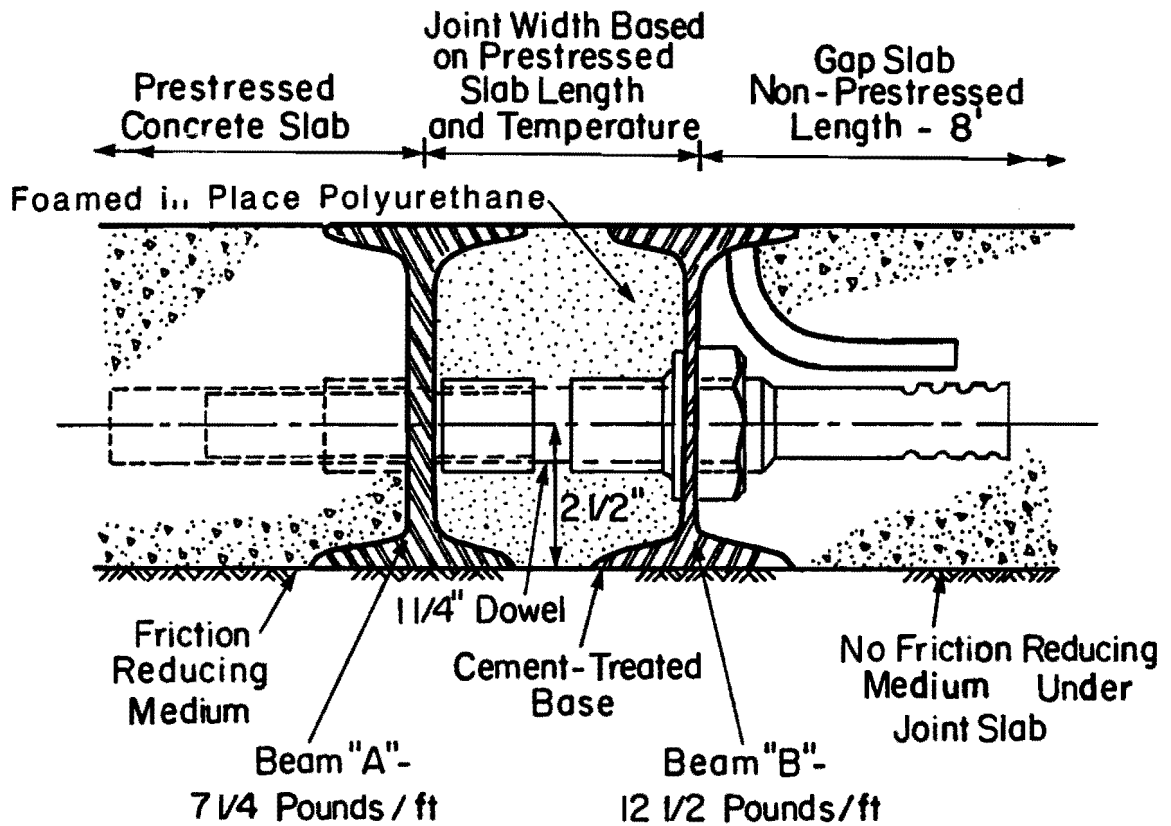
Joint detail for prestressed pavement at Dulles International Airport, Virginia (Ref 105).
